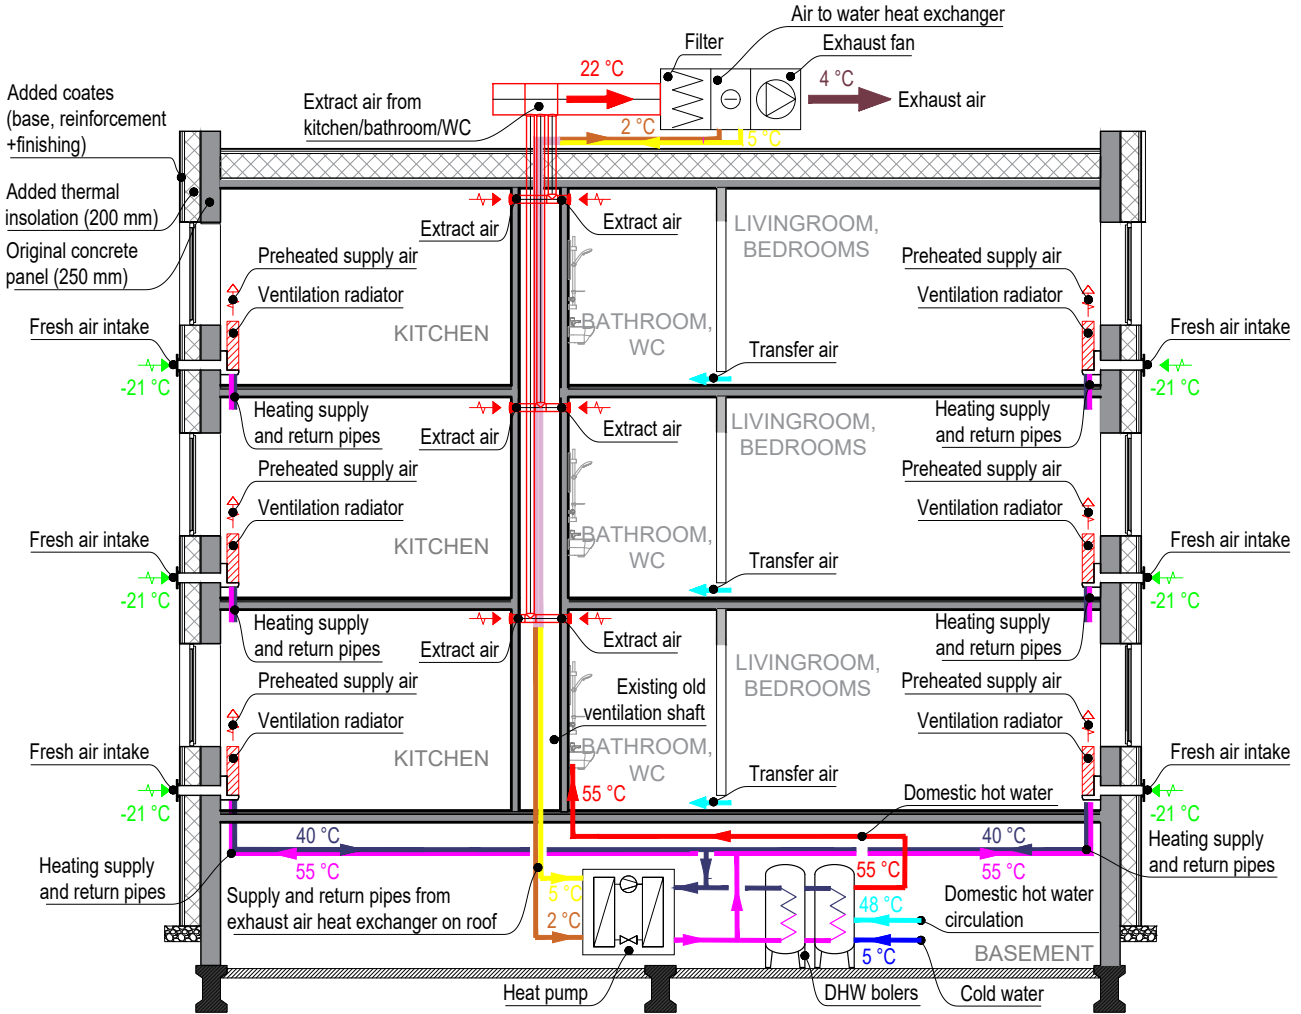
A section of CHR system with ventilation ducts inside the building façade.
